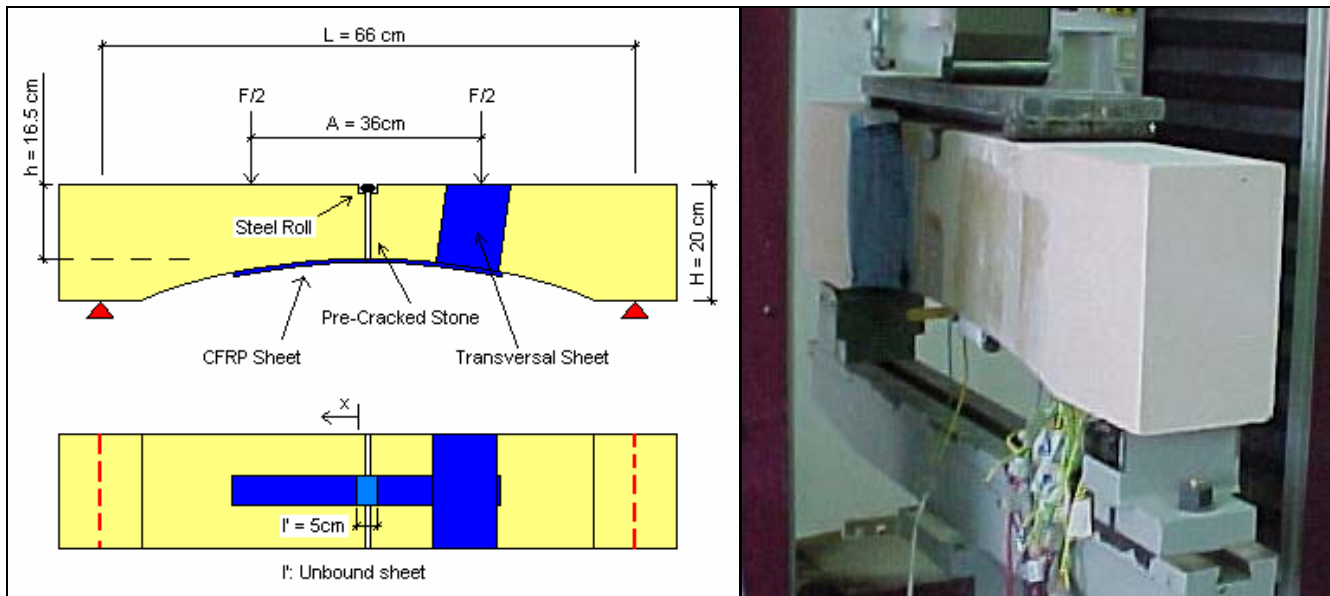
Tested specimens: a) scheme of loading conditions, b) specimen under test
